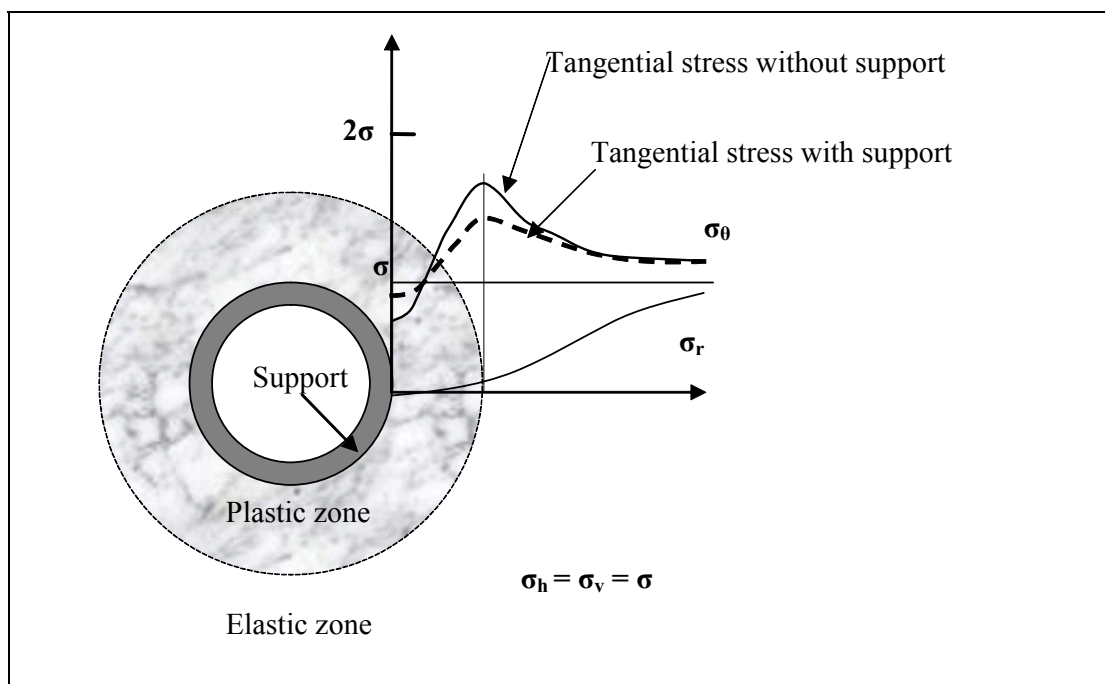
Stress distribution around a tunnel after the application of the tunnel support.
